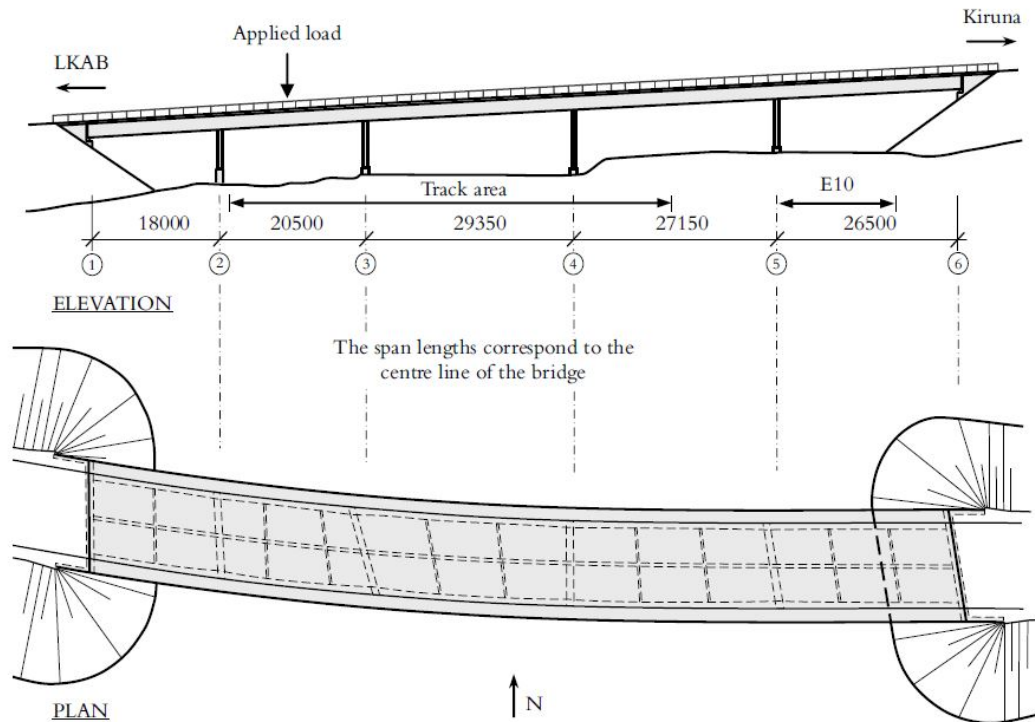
Kiruna bridge elevation and plan adapted from (Bagge & Blanksvärd n.d.).
